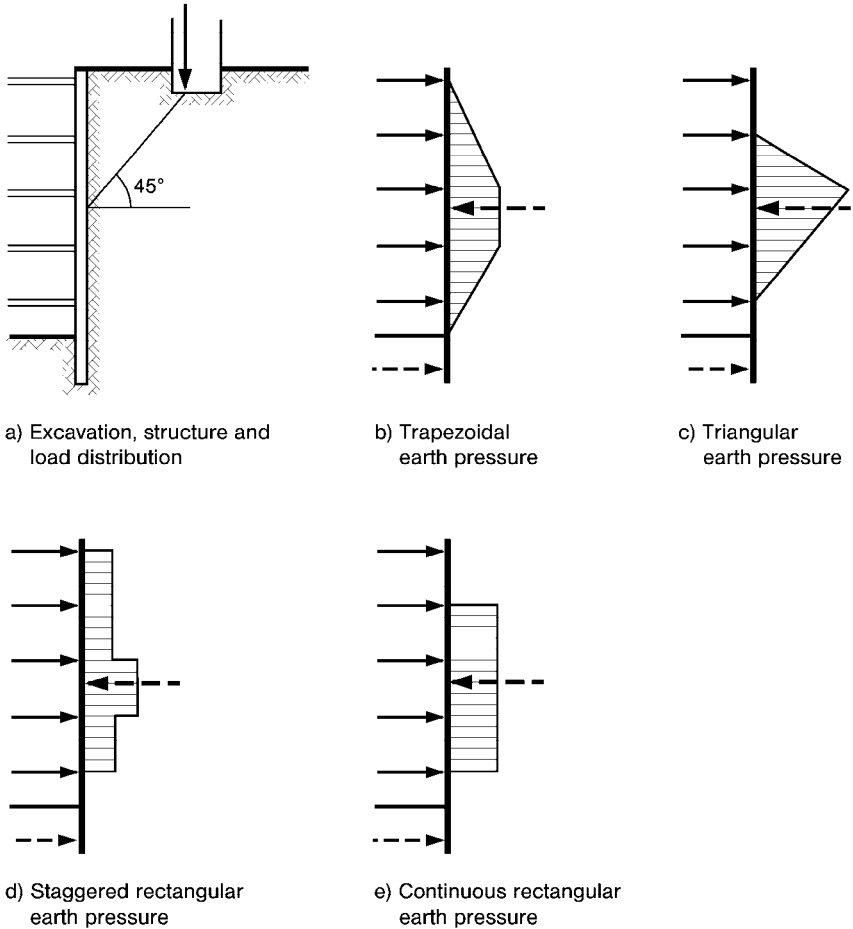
At-rest earth pressure approximations for building loads and non-yielding retaining walls
